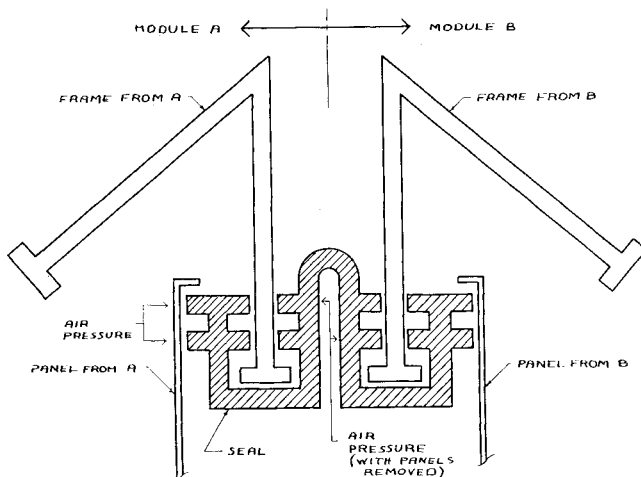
Cross-sectional schematic view of the seal region between two different modules, indicating the relationship of principal components. When two modules are placed face to face as shown, both of the panels illustrated would normally be removed to provide a large unobstructed volume; at least one of the panels must be removed due to the outwardly bulging panel forms. "T" sections on frames balance corner "V" sections, providing necessary rigidity in the seal regions for potentially high columnar loading, and also hold seals in place before air pressure is applied.
